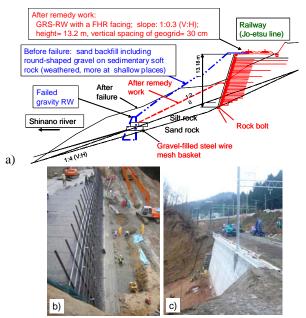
a) Railway embankment that collapsed during the 2004 Niigata-ken Chuetsu Earthquake and its reconstruction to a GRW RW having a FHR facing; b) the wall during reconstruction; and c) the completed wall (Morishima et al., 2005).
